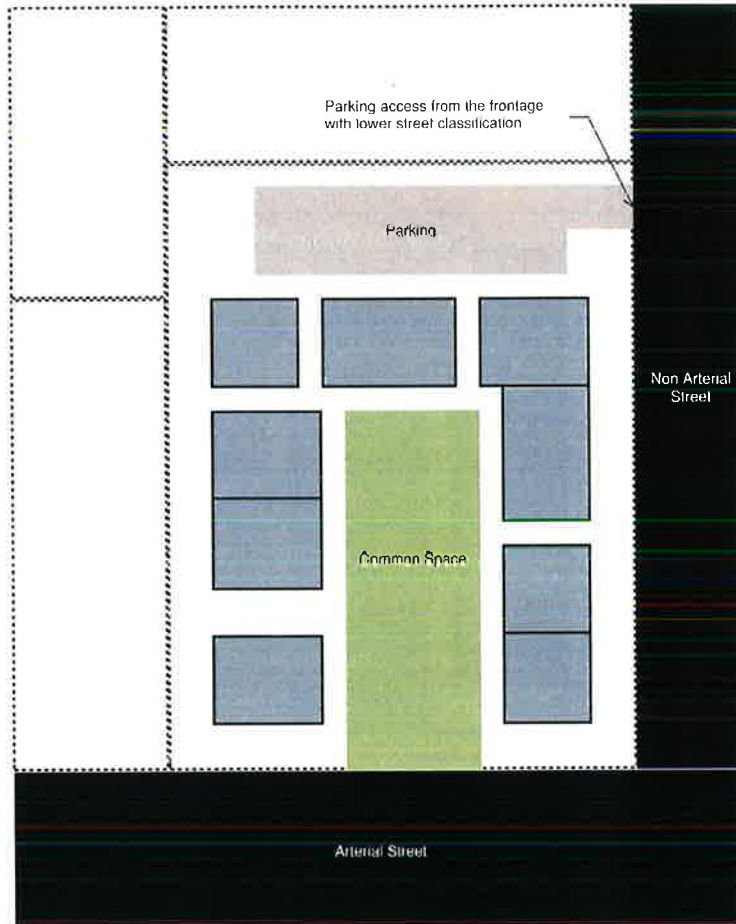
(A)(1): Cottage Setbacks and Building to Building Placement
